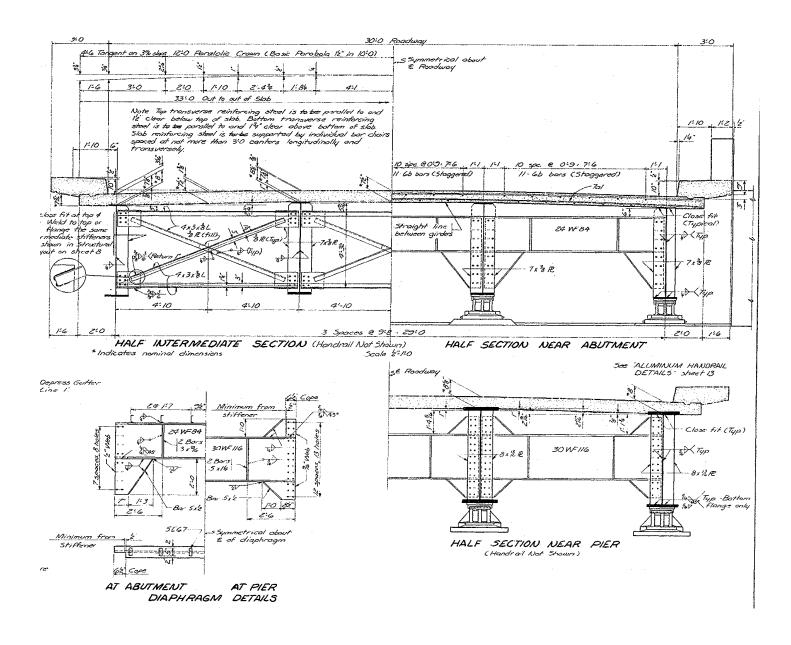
Bridge sectional views of I-80 Bridge over the Cedar River.
